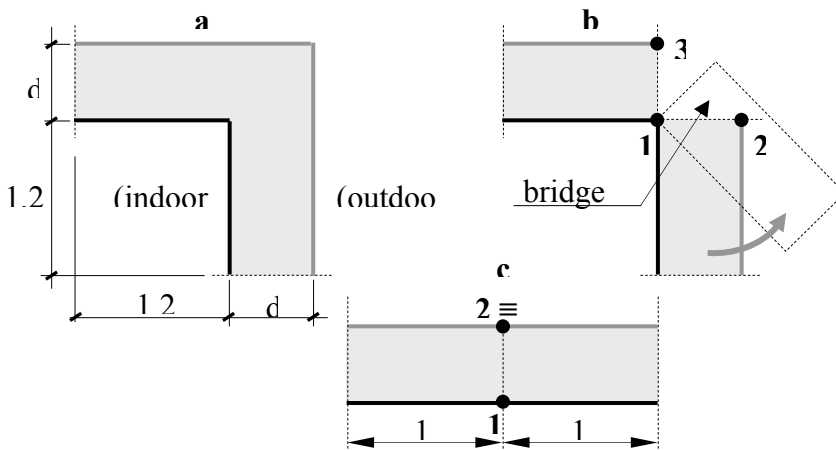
Thermal bridge situated at the intersection of two exterior walls – outer corner
